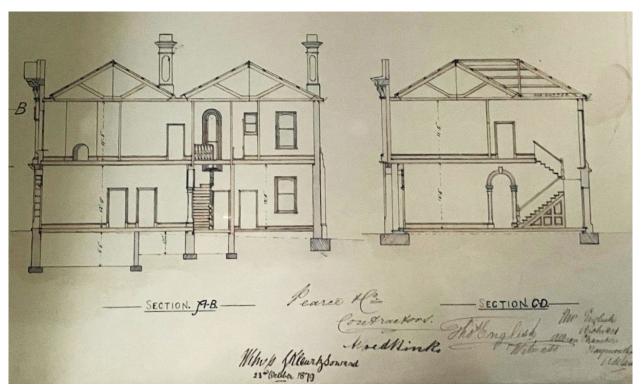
Sections, Part Crown and Anchor Hotel Contract Drawing, 1879 Source: State Library of South Australia, B 58651
